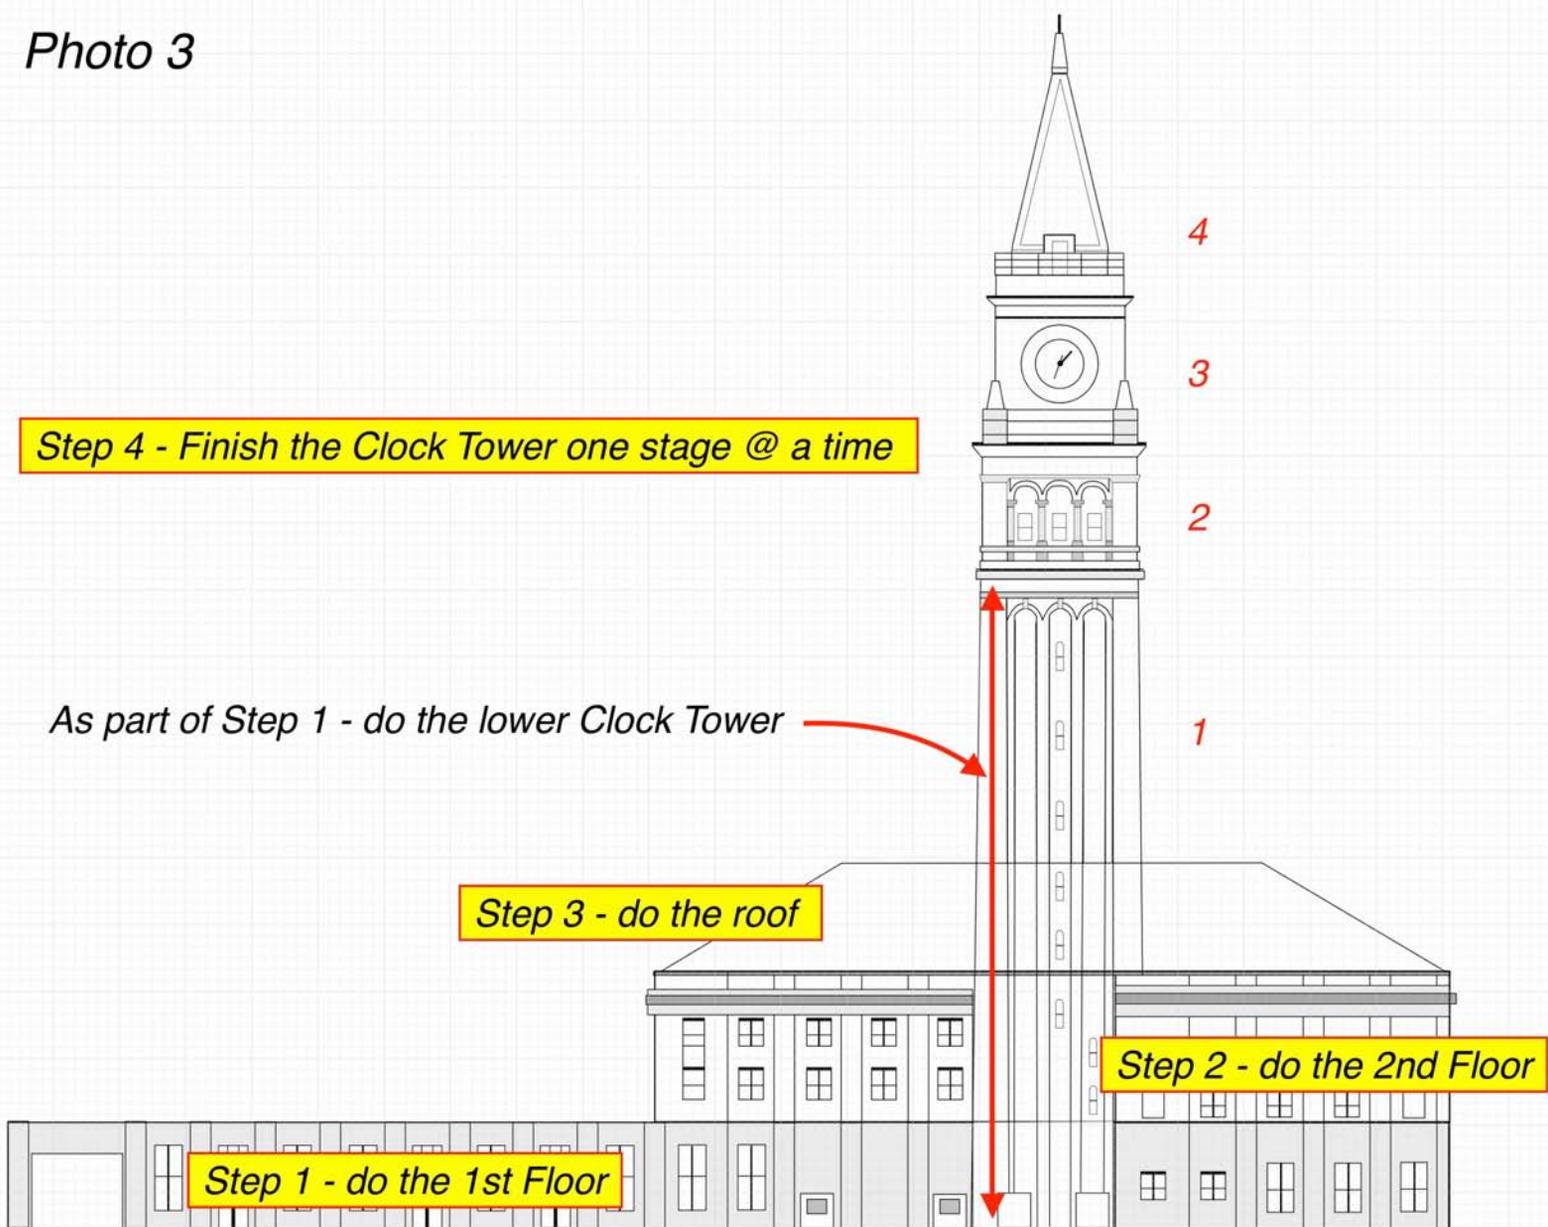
One my early illustrator drawings of King Street Station with my basic plan of how I would break down the construction into sections of work.
